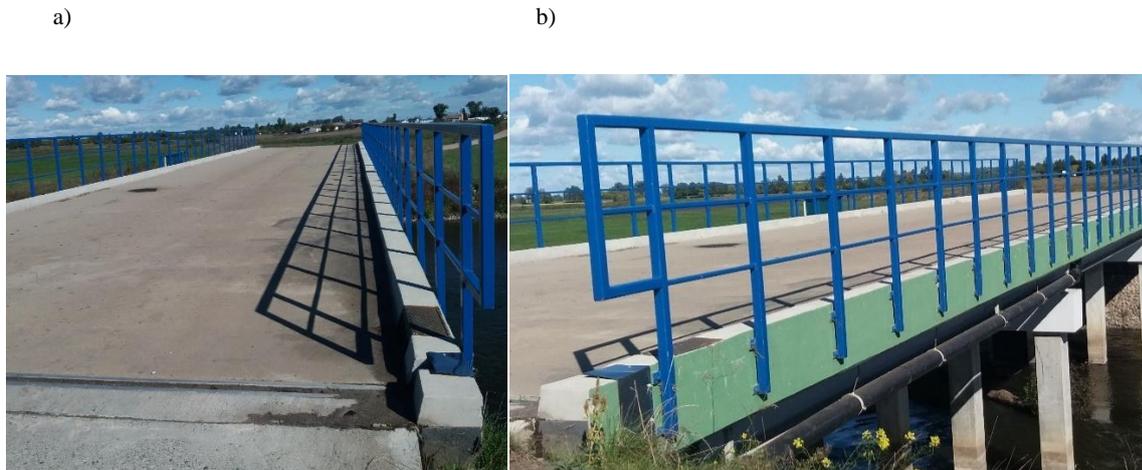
View of the bridge: a) roadway, b) railings (author's work).
